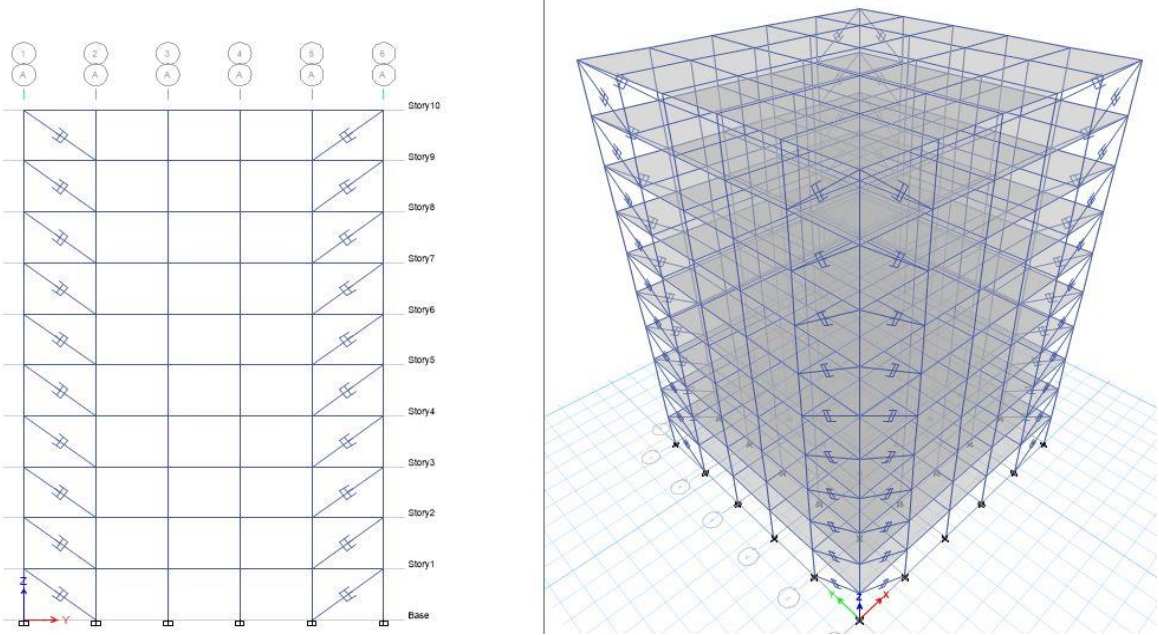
RC bare frame, dampers at corner, in all storeys (BDCA)
